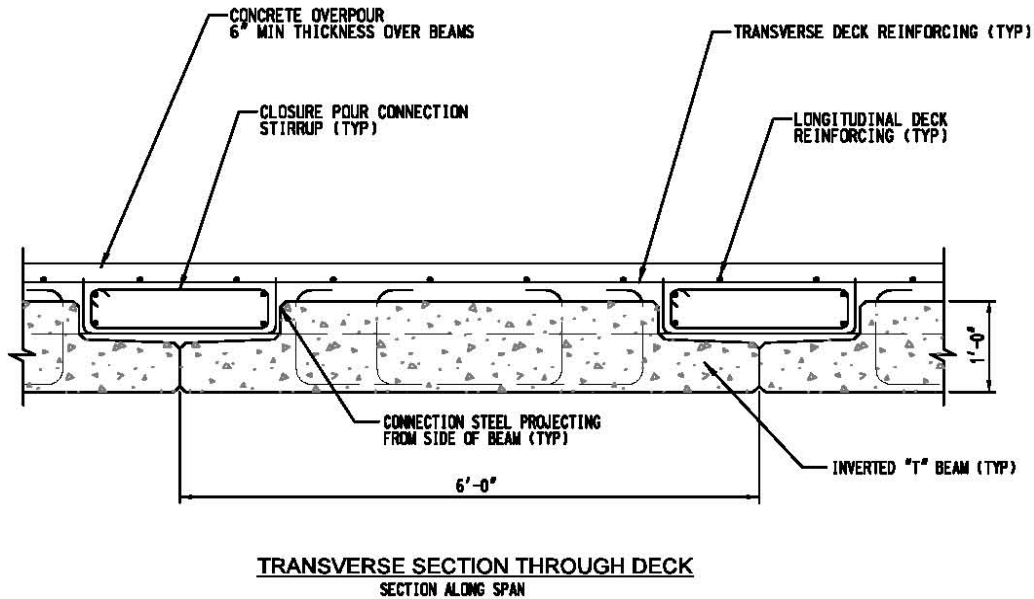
Connection details for a precast inverted tee beam (FHWA, 2013a)
